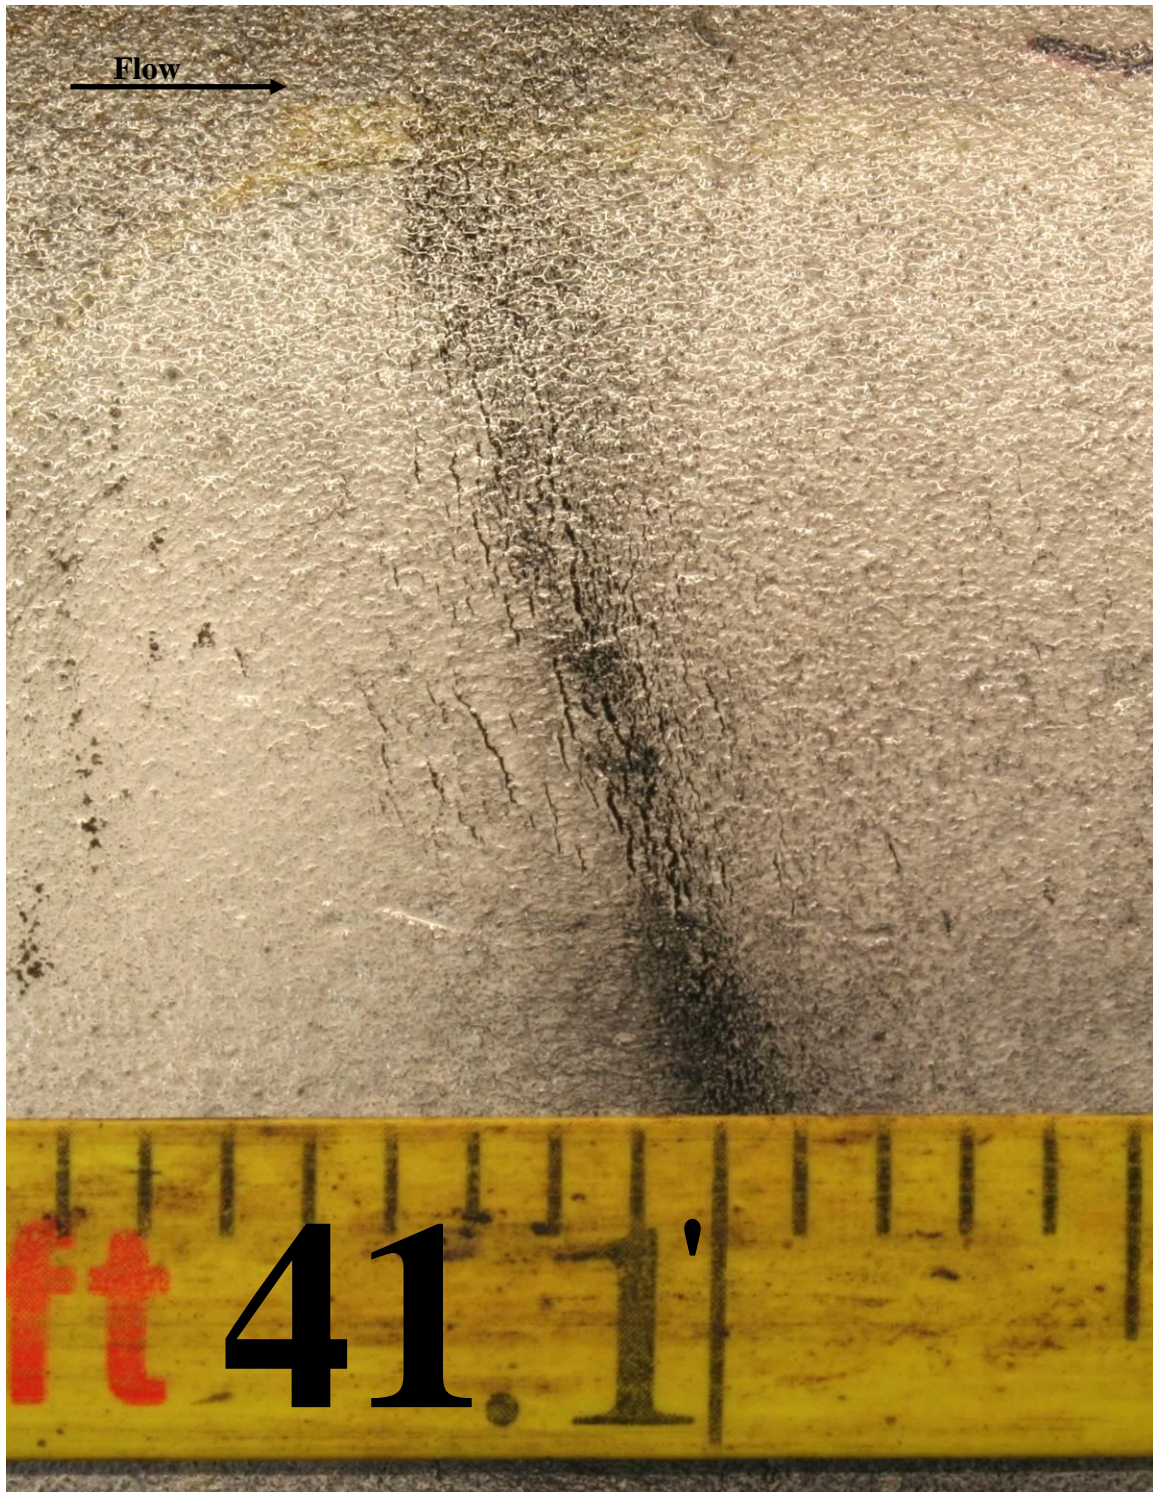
Photograph of the external pipe surface showing Crack Colony 6C following MPI. The tape measure indicates the distance from the U/S girth weld.
